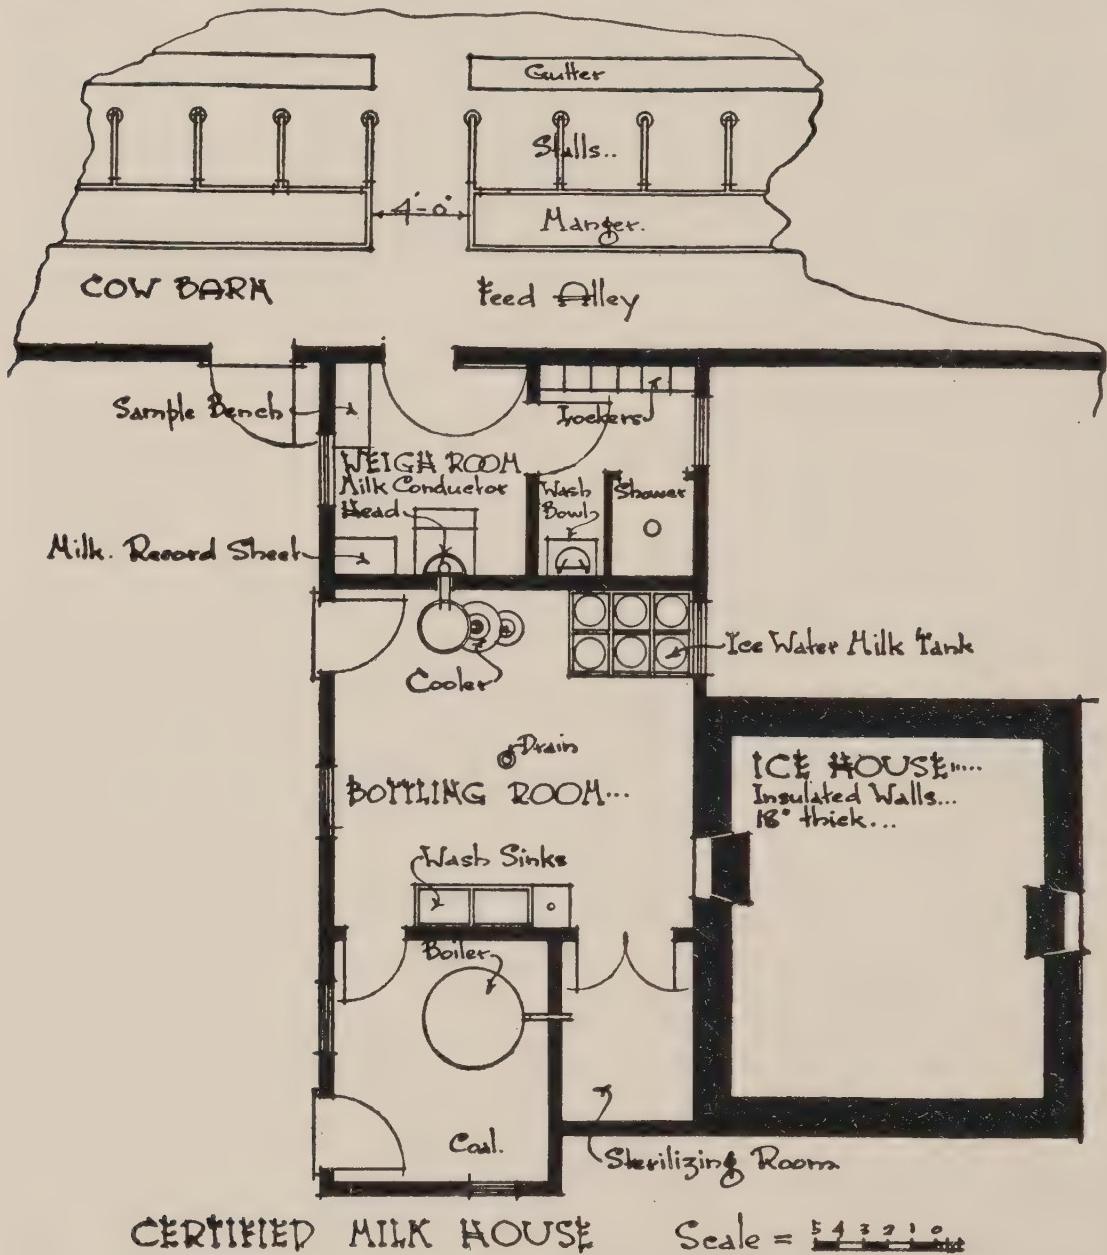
Plan of milk house connected to, yet separated from, the cow barn. There is no door between the weigh room and the milk room. (Adapted from the certified milk plant of "The Arden Farms," St. Paul, Minn.)
